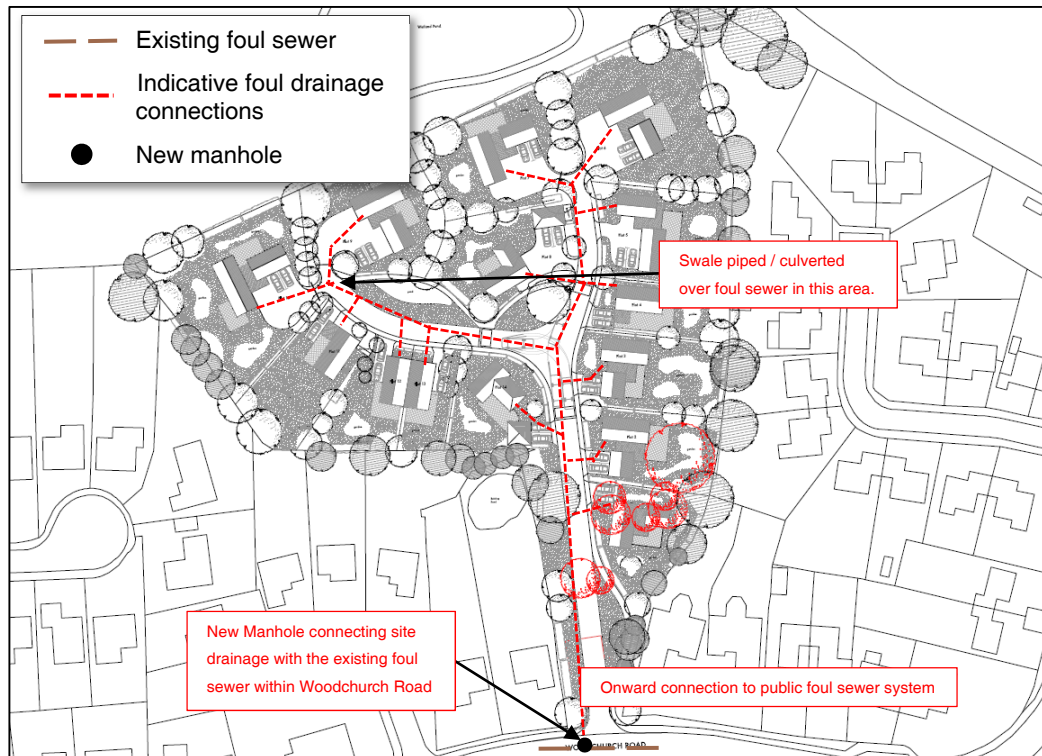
Indicative drainage layout plan for the proposed foul drainage at Woodchurch Road.
